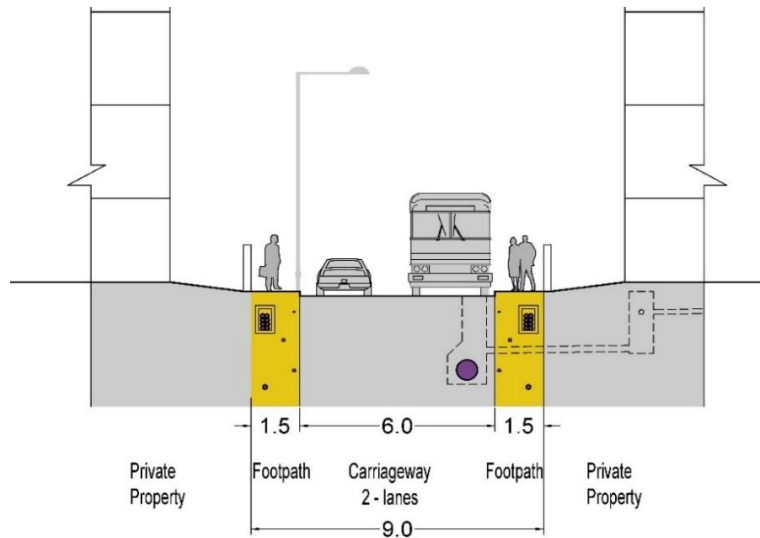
TYPICAL SECTION OF 9M WIDE ROAD
